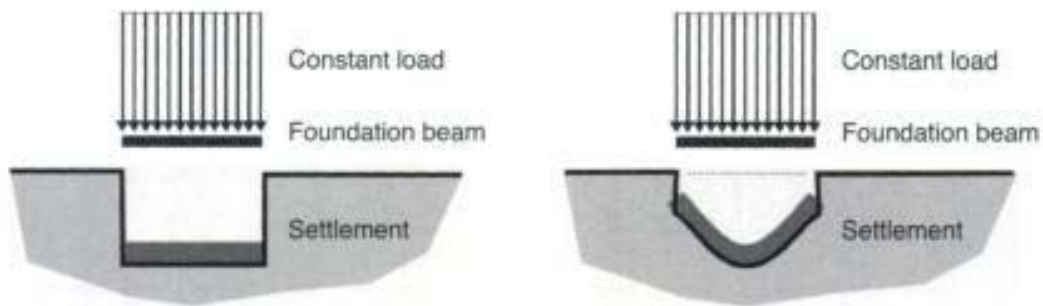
Deformation of soil and structure – foundation modulus and constraint modulus method
